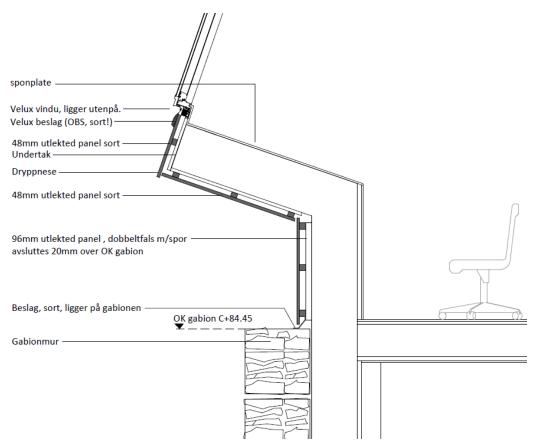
The transition from the upright wall elements to the windows in the north-west facing tilted wall. Source: Snøhetta.
